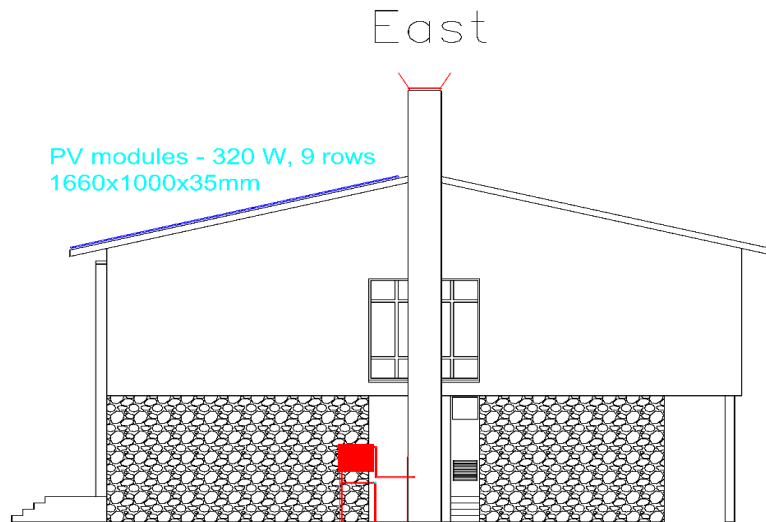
PV arrays of Photovoltaic power plant on UNISB building in I. Gundulić Street (front plan, east side)
